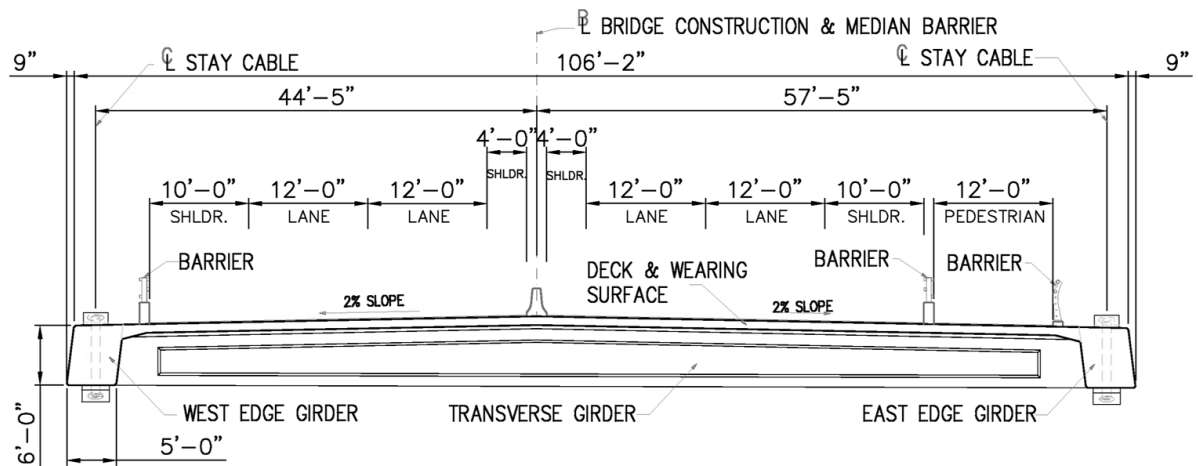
Indian River Inlet Bridge Deck Cross-Section View of Cable Supported Spans
